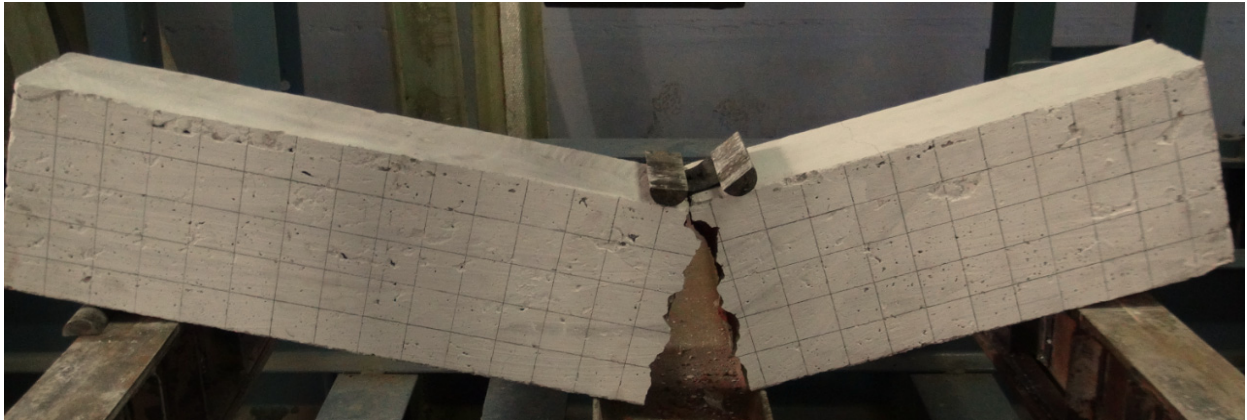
Failure mode of control masonry beam (CMB)
